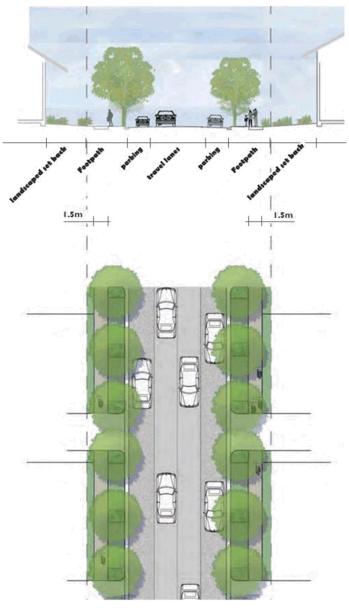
Minor local street (predominantly in residential areas). Opportunities for street tree planting is constrained by the location of services and driveways. It is desirable to achieve a minimum of one street tree per lot in residential streets to achieve a continuous cover. It is recommended that a uniform species is used to maximise visual impact.
